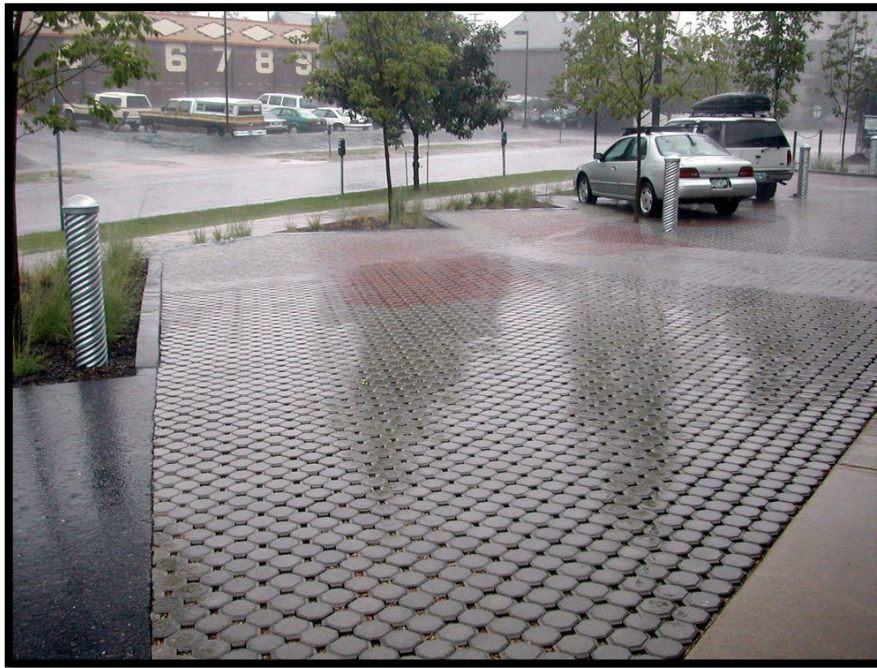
A type of permeable pavement (Source: www.nacto.org)
